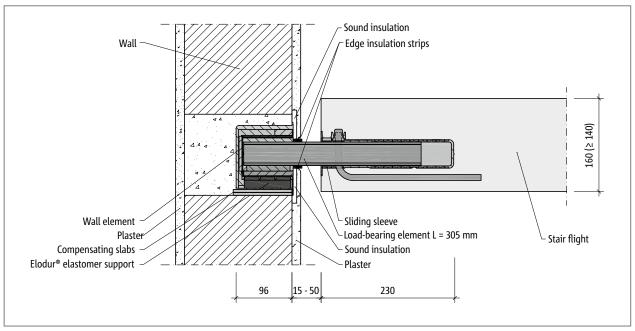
Schöck Tronsole® type Q-FV or Q-A2: Installation cross-section with precast stairs flight
